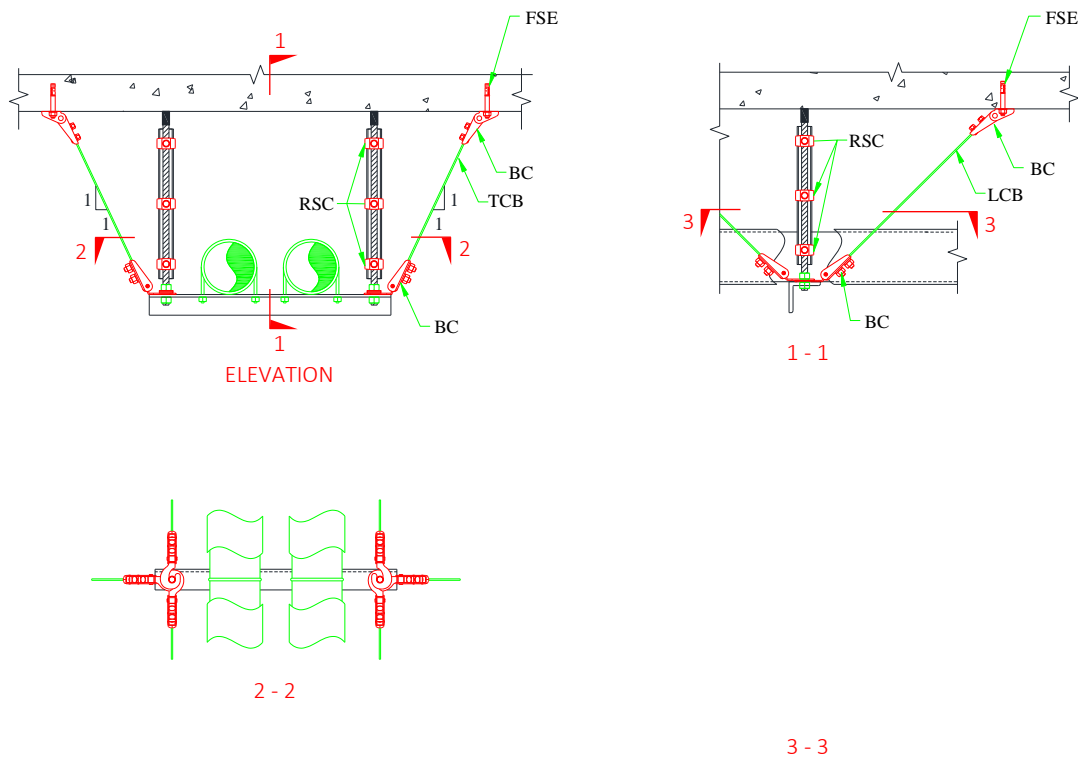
Seismic Cable Bracing for Trapeze supported pipes
